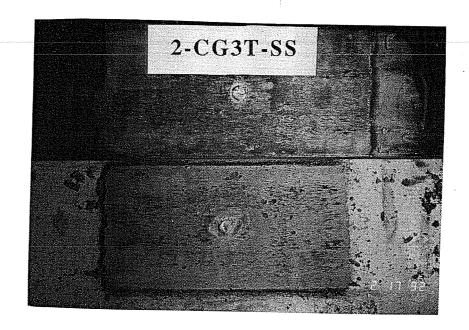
Grout interface after failure - Test 2-CG3T-SS
